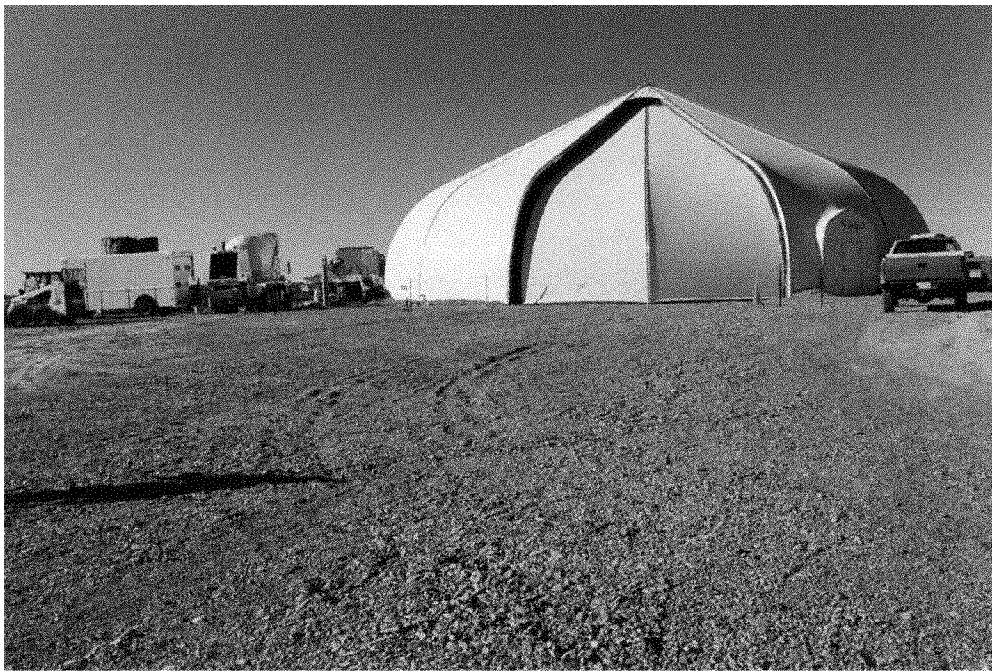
Weather structure constructed over the pit (Photo PNOL-520-1-1).
